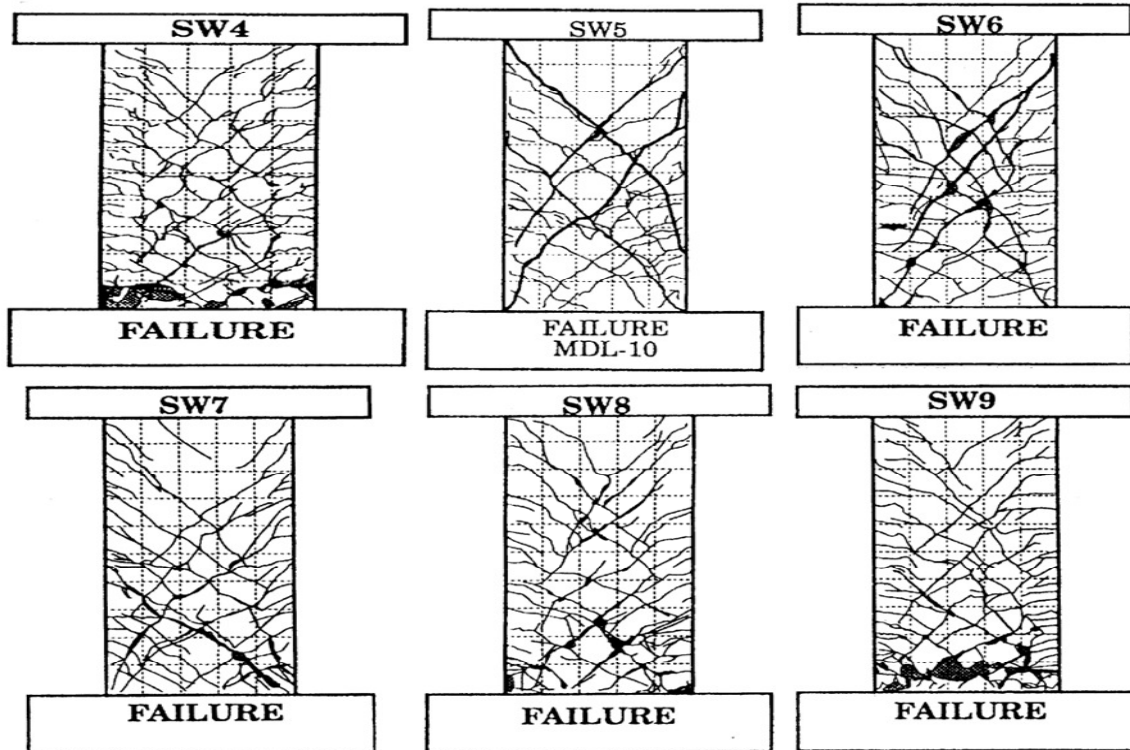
Experimentally observed crack patterns at failure in the walls tested by Pilakoutas and Elnashai (1995)
